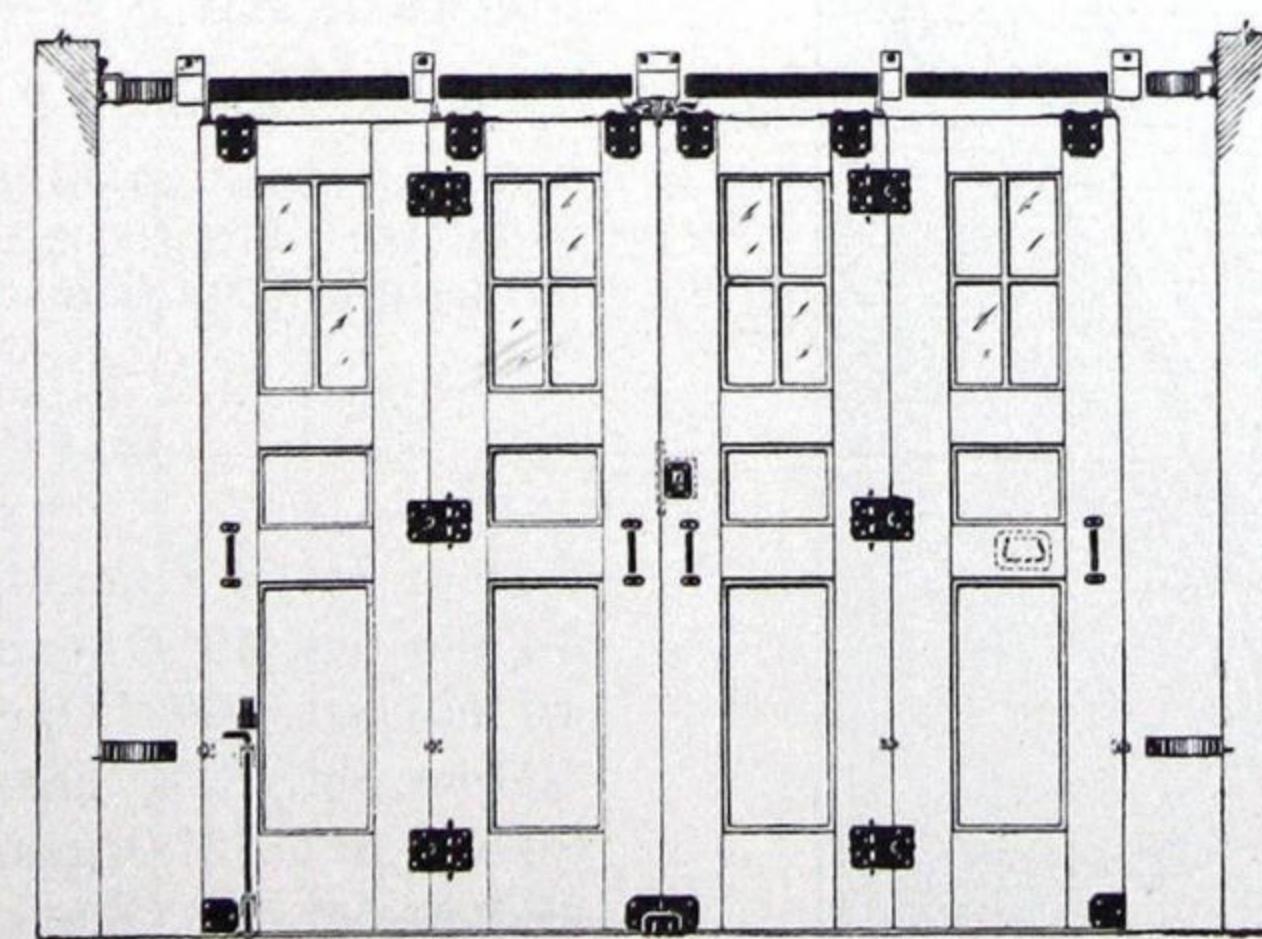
Interior elevation showing 635 Hardware Set UU-3, including one 525 Door Lock and one 524 Cane Bottom Bolt.
